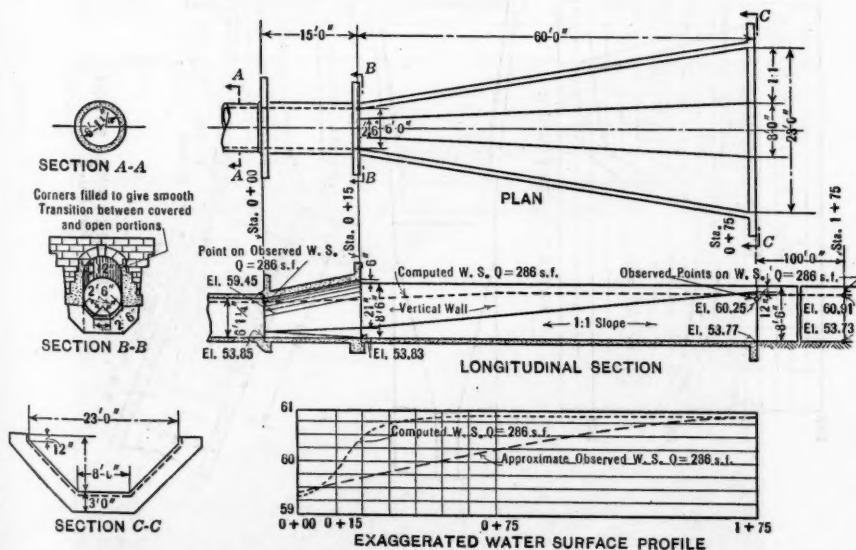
PLAN AND CROSS-SECTIONS OF OUTLET, NORTH FORK TUNNEL, TIETON CANAL.
